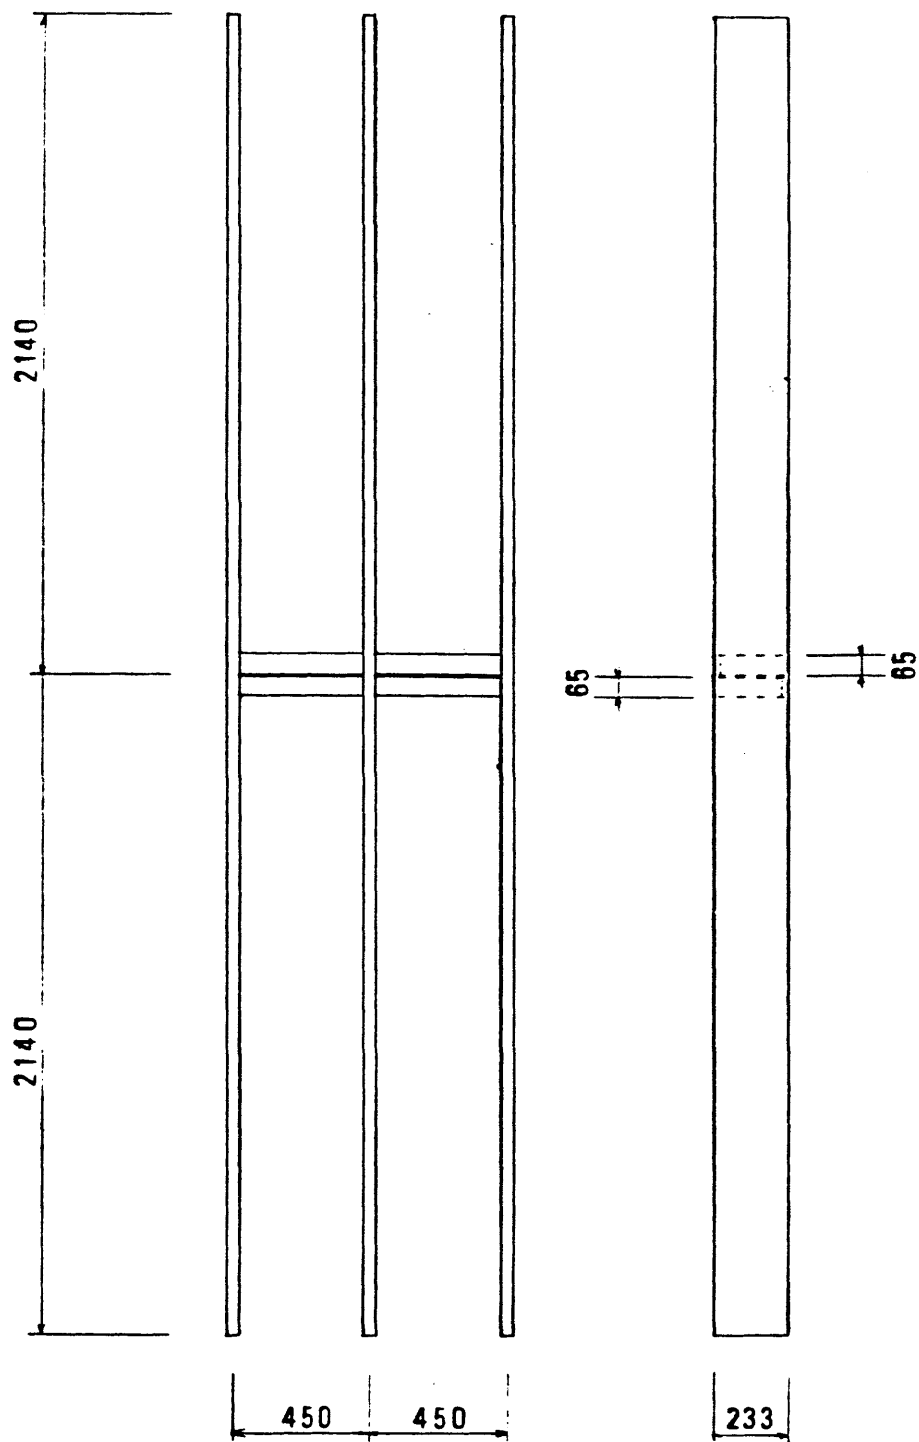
3 2 Construction detail of No. 6 - 7 specimen.
